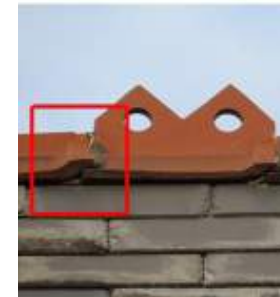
Ridge tiles on the chapel; mortars and connections noted. Photo by Laura Stokley, 2015
